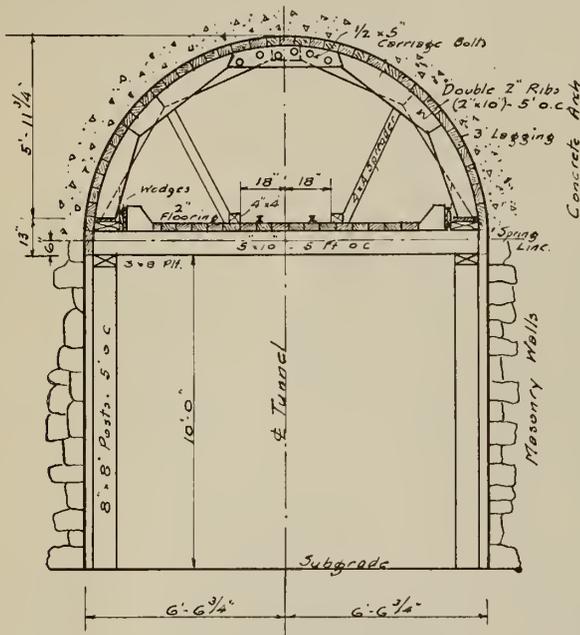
Tunnel Form used in Pouring Concrete Arch.
